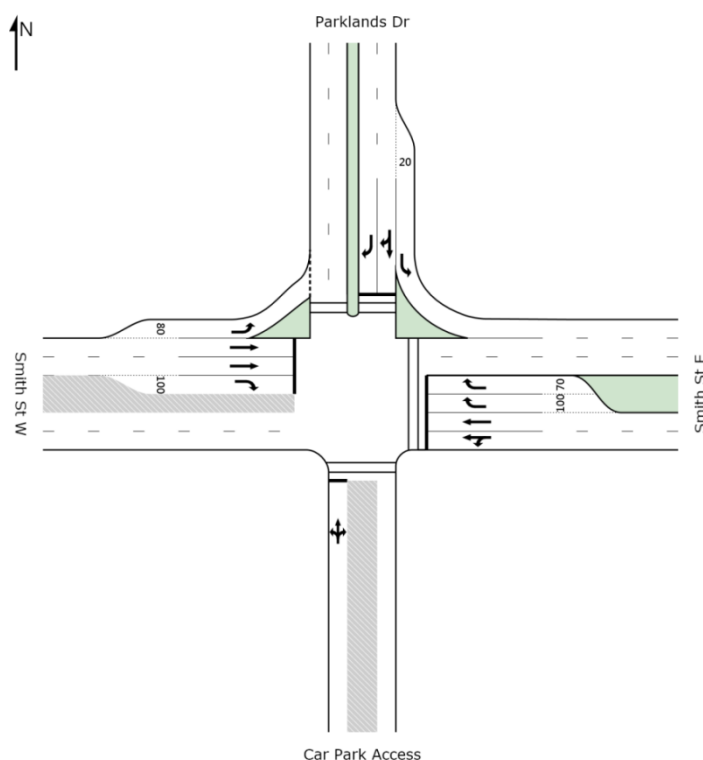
Smith Street / Parklands Drive – SIDRA Analysis Layout
